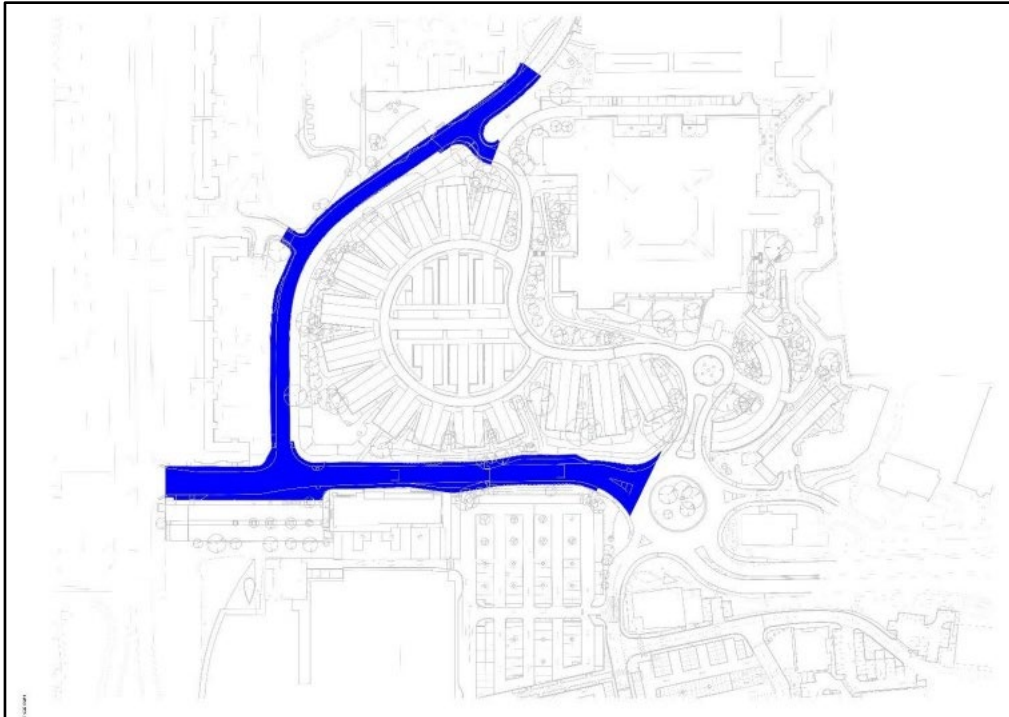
Areas of Hemingway Road and Schooner Way to be stopped up
